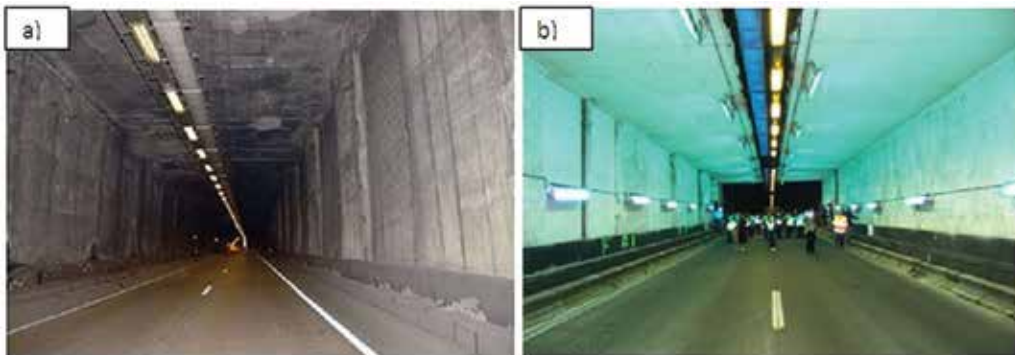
Inside view of test site within Leopold II tunnel in Brussels (a) before renovation, (b) after renovation with using photocatalytic walls [15].
